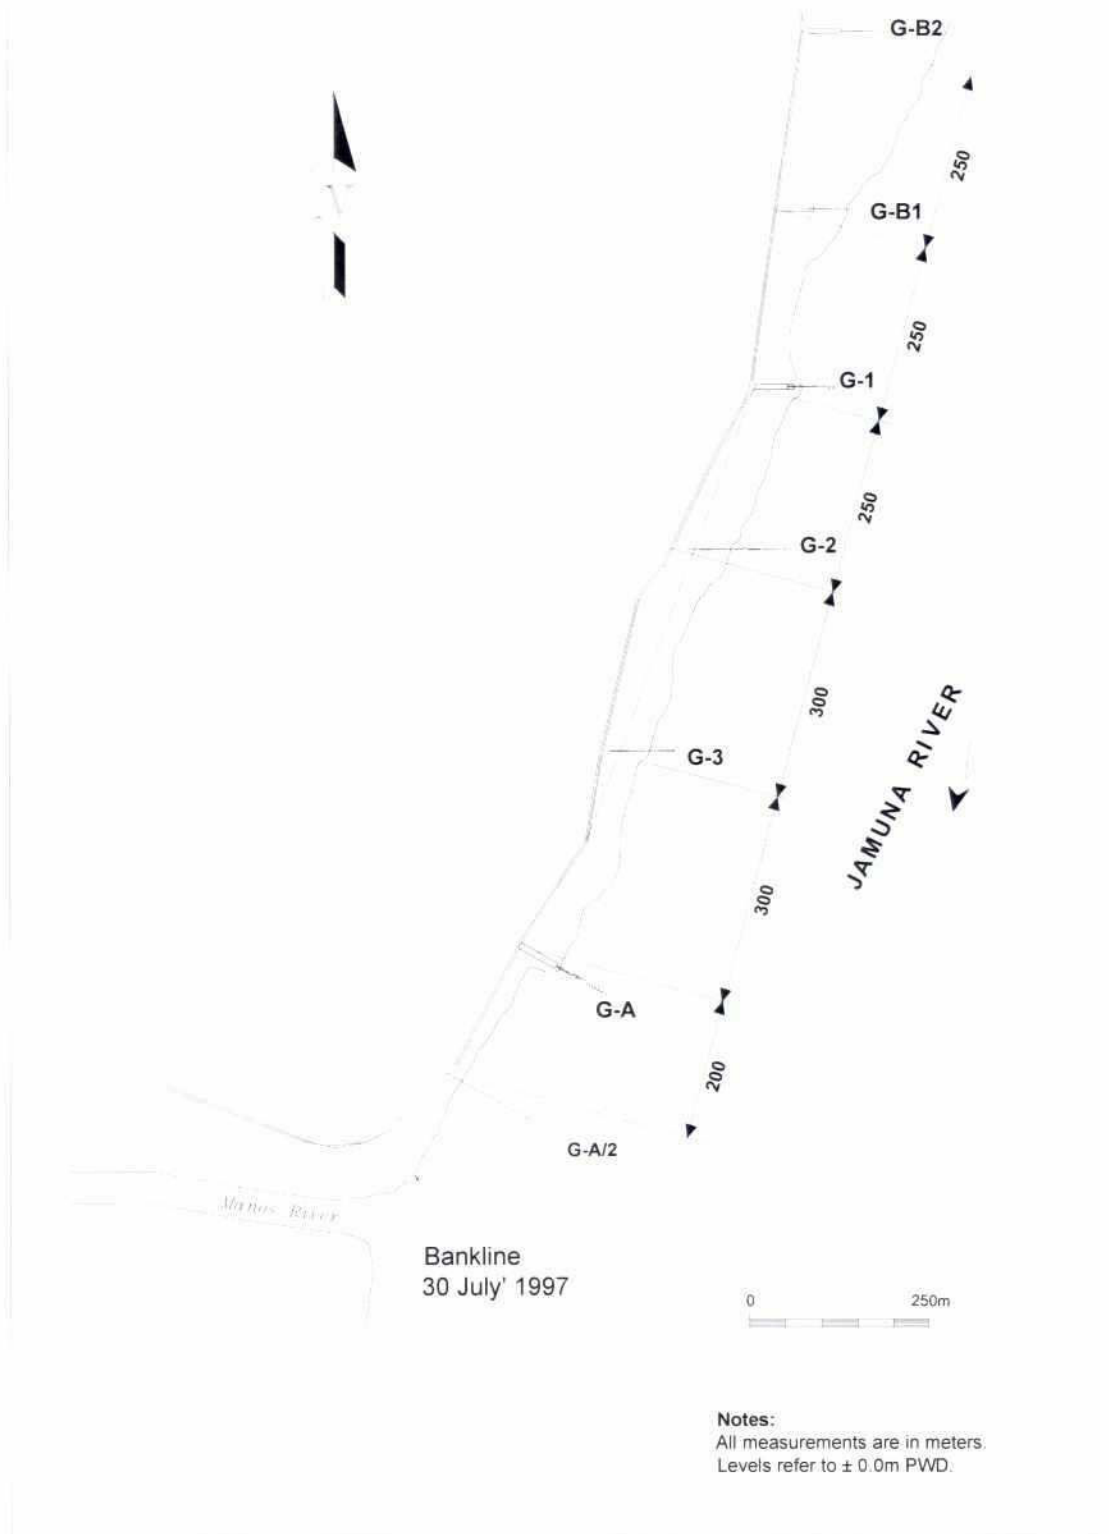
General Layout of Groyne Field – Adaptation of Test Site I
